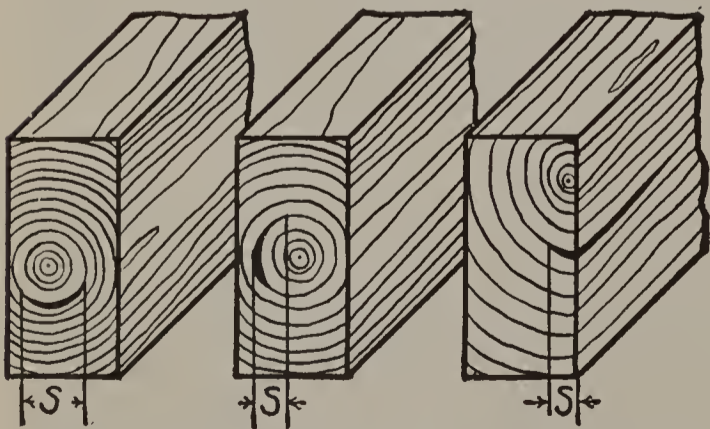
Measurement of shakes in beams and stringers or joist and plank.
